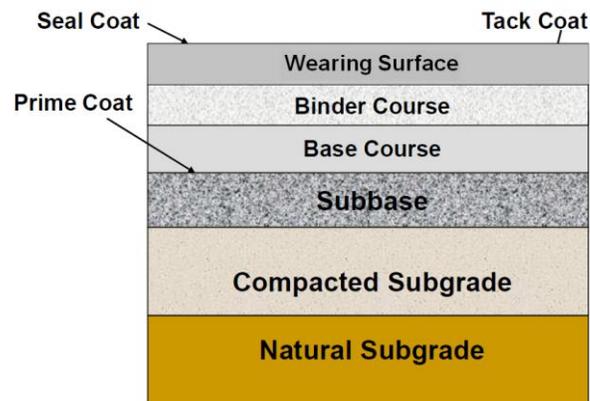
Conventional flexible pavement (after Al-Qadi, 2012)
